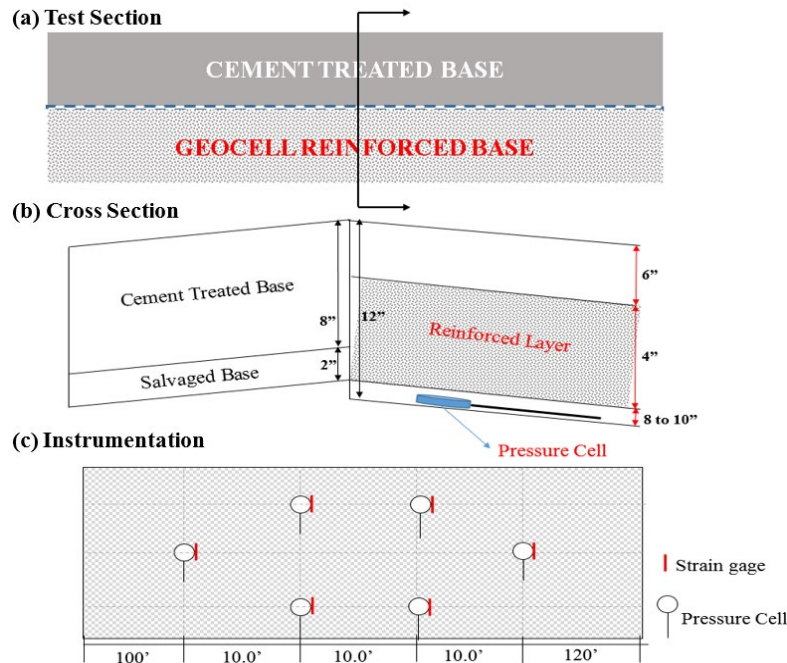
Cross Section and Instrumentation of FM 906 at Testing Site for Geocell Reinforced Section.
